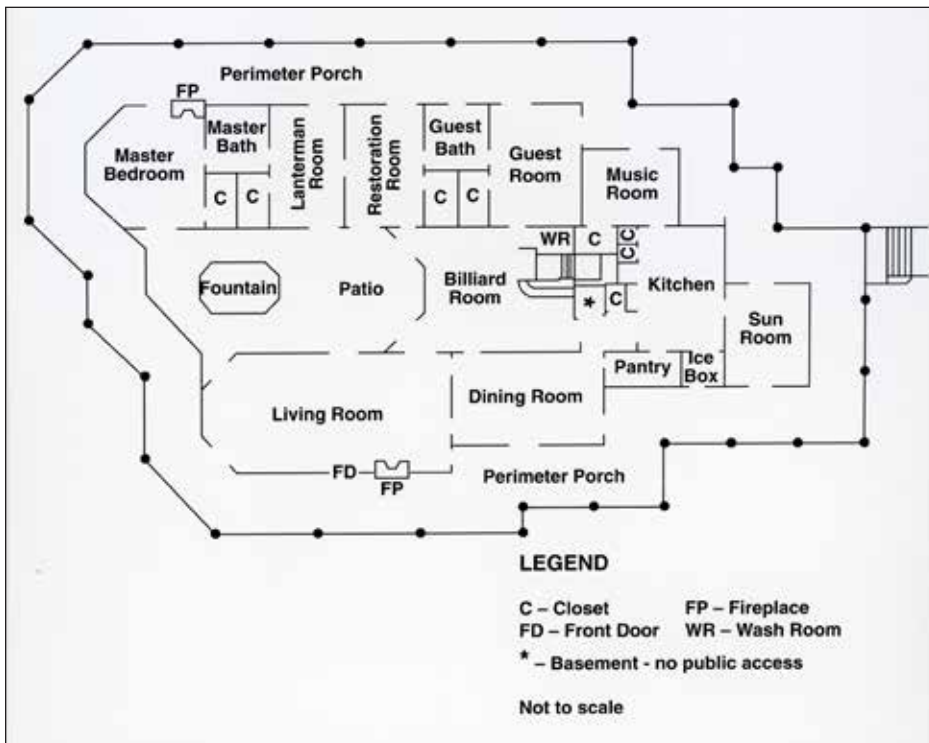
Lanterman Residence, ground floor plan (not to scale). The front courtyard (See Figure 24a), like those in many of Haley’s apartment houses, brought light and air circulation to interior rooms. The wrap-around perimeter porch, with overhanging eaves on the sunny sides of the house and a pergola over the north-facing back of the house, moderated the sunlight and temperature in the house. Every room has a direct exit via French doors, a fire and earthquake safety measure as well as an encouragement to indoor-outdoor living in a country house and the means of cross-ventilation for every room. Upstairs, a commodious sleeping porch (Figure 24b) reinforced this open lifestyle. At the back of the house (on the right in the plan), the kitchen was not only well lit, but served meals in a screened porch or in the sun room (Figure 24c). Also like the apartment houses, the Lanterman house has a ballroom upstairs for community social gatherings (Figure 26), while the medical office and laundry area are placed in the basement with their own entrances (Figure 27) to separate them from the residential and social quarters. (In this plan, the bedrooms for the parents, the two sons, and guest room, with bathrooms between them, are labeled as to their current use in the historic house museum.) *Lanterman Historical Museum Foundation*, “Lanterman House: Gem of the Foothills,” (La Cañada Flintridge, CA: n.d.), 21. *Courtesy of the Lanterman Archives.
